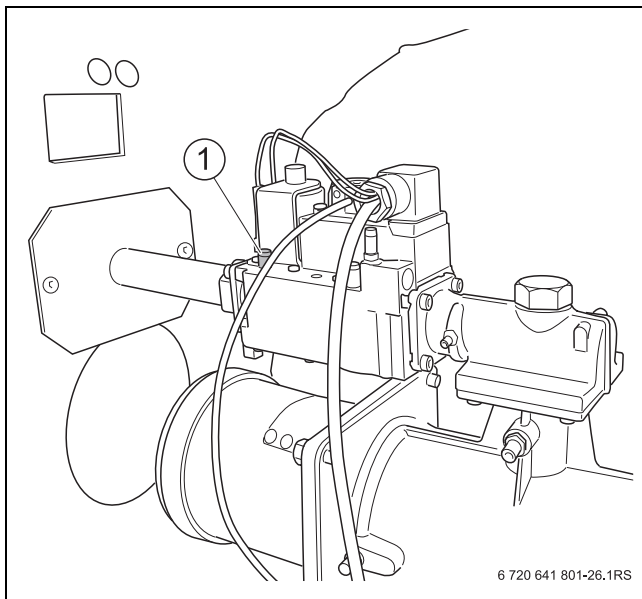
Checking the internal tightness (boiler size 90/120 kW)
